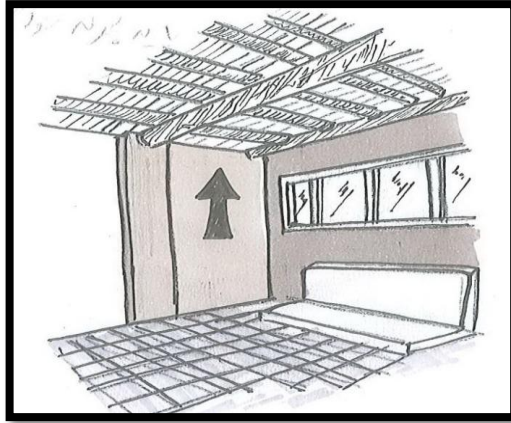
Usage of Wooden Beam (Jarín and Kaleiléh) in Coffee house, Masouleh, (By author)
